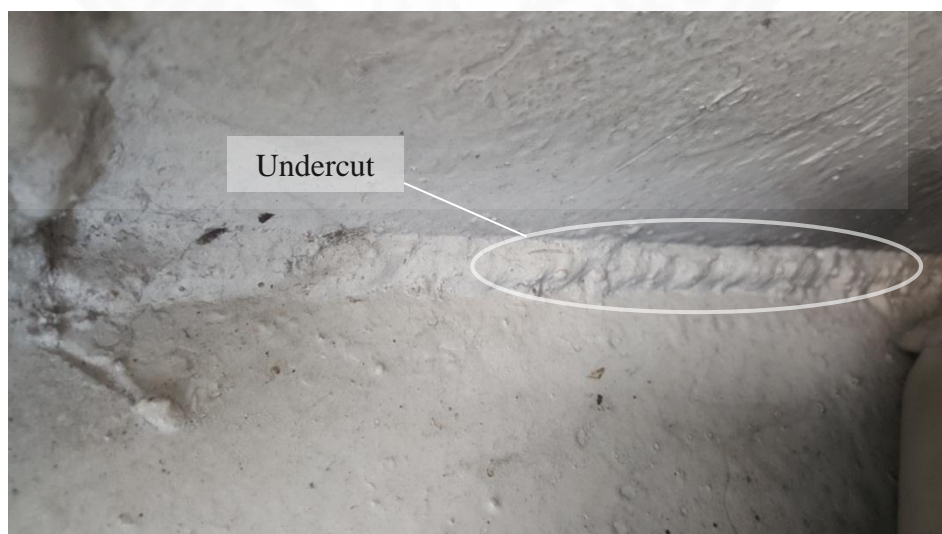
Welding defects on Steel Structure B (joint 2)
